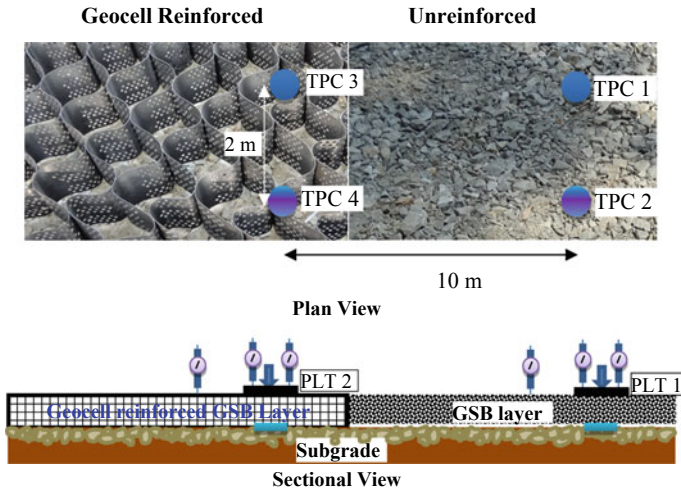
Plan and sectional views of the reinforced/unreinforced test sections
